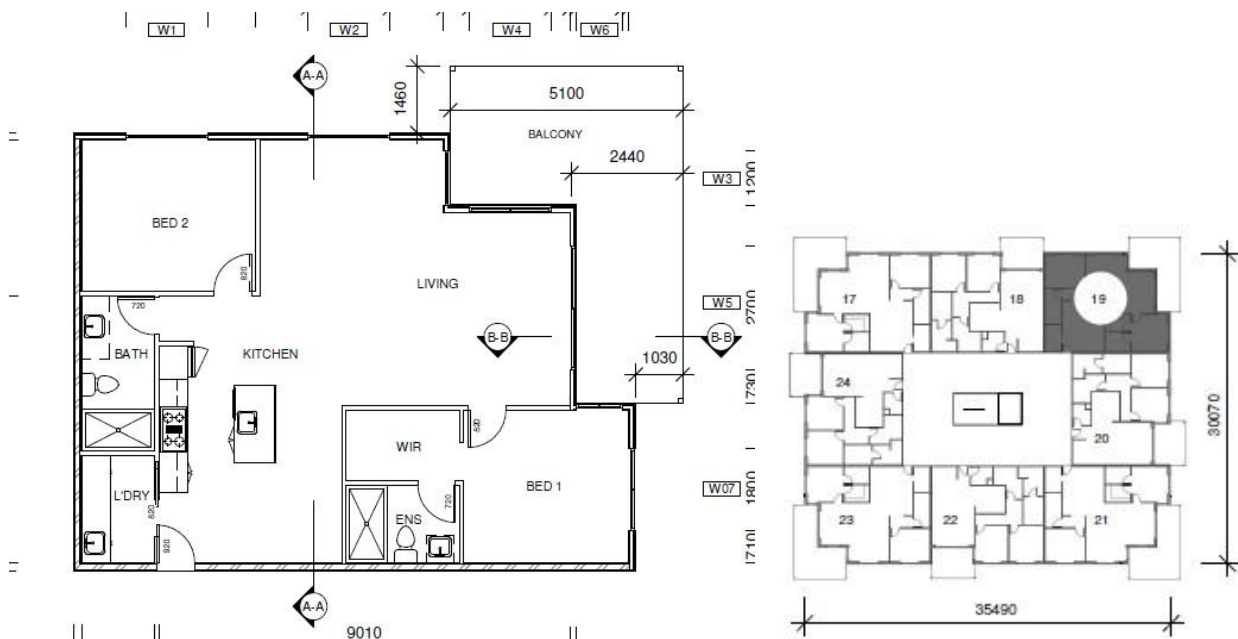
Apartment SBA630 - Floor Plan (Left) and location plan within the overall apartment building (right)
